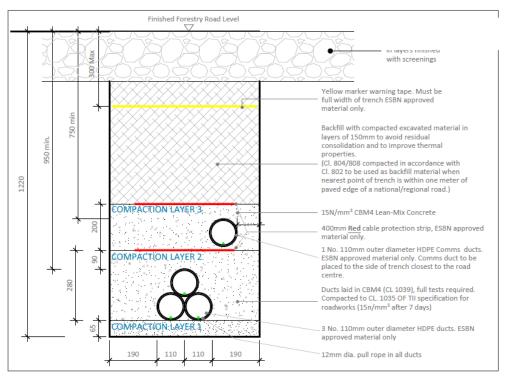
Typical 38kV Single Circuit Trench in Forestry Road Section
